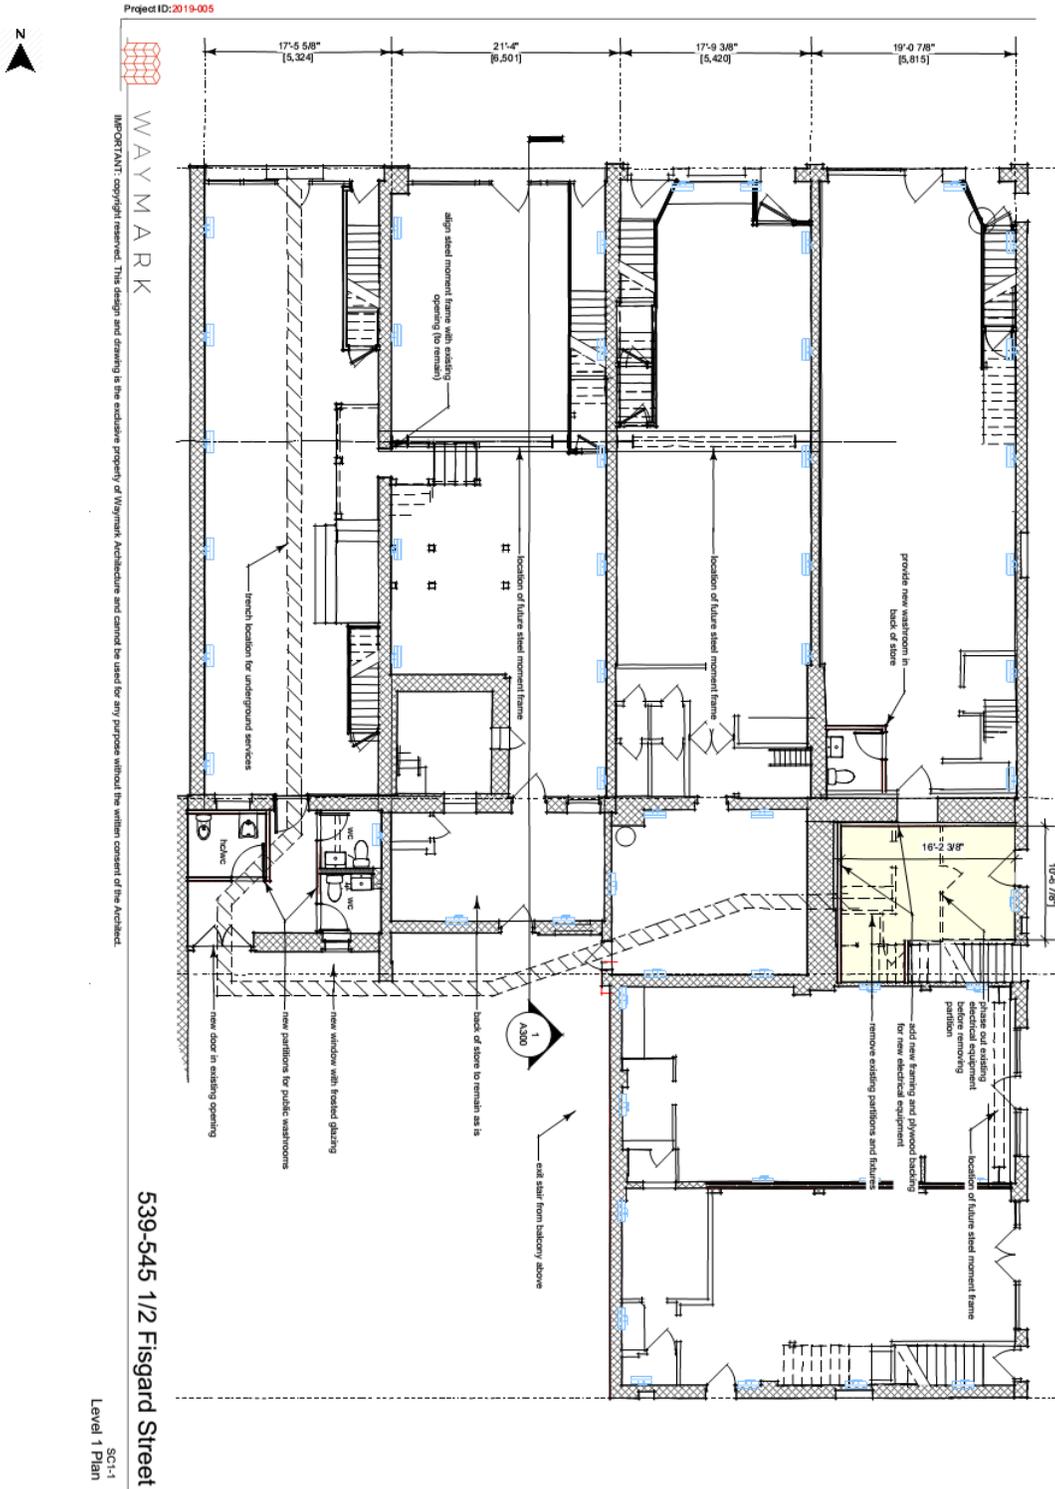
, Layout of 1<sup>st</sup> floor of the building
